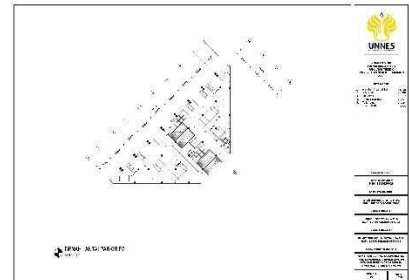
3<sup>rd</sup> Floor Plan
